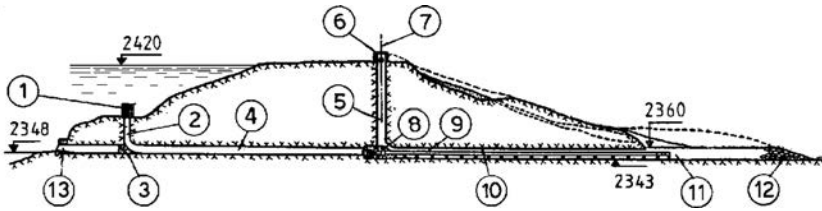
Outlet structure for the Green Mountain dam (USA), built in 1943 (the diversion tunnel has been transformed into a bottom outlet). (1) Trash rack at the intake of the outlet; (2) intake shaft of the bottom outlet,  $D = 4.1$  m; (3) concrete plug of the diversion tunnel; (4) tunnel,  $D = 5.5$  m; (5) shaft for controlling the bottom outlet,  $D = 6.0$  m; (6) mechanism for lifting the gates; (7) axis of the dam; (8) gate chamber; (9) welded steel pipelines (two),  $D = 2.5$  m, installed in the tunnel; (10) tunnel with a horseshoe cross-section; (11) channel; (12) tipped rockfill; (13) intake into the diversion tunnel.
